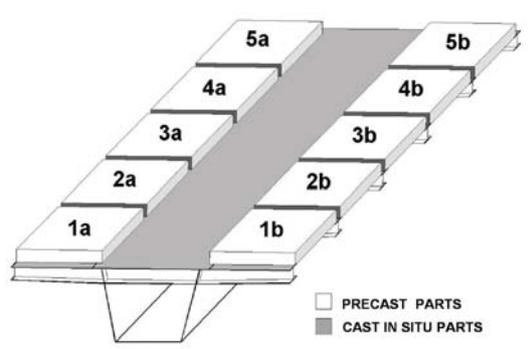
Precasting/In-situ casting distribution for a closed box girder deck with directly supporting cross-beams and cantilevers
